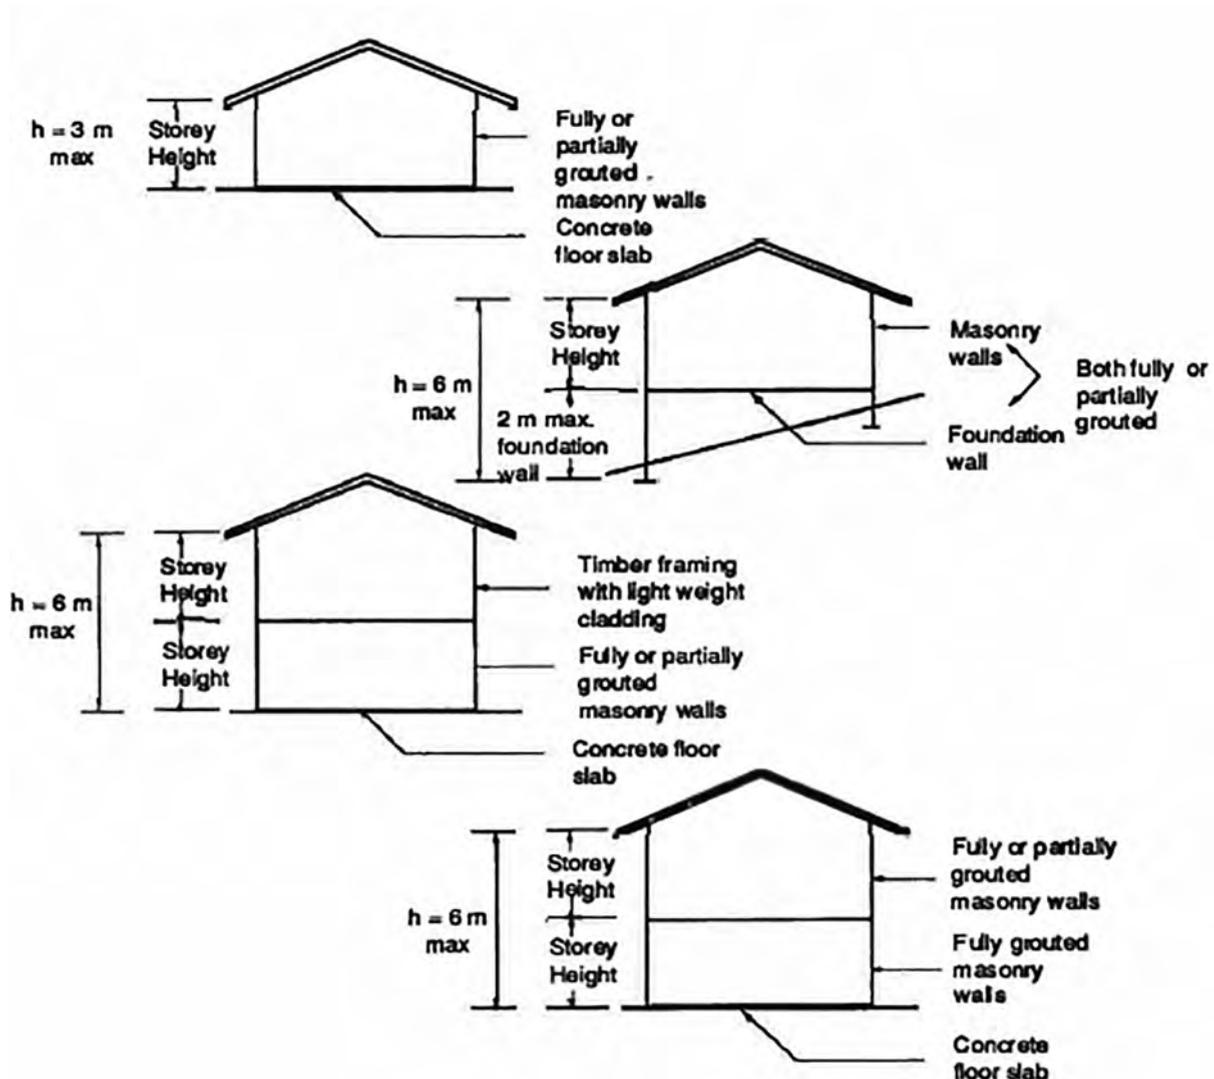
TYPES OF MASONRY HOUSES CONSIDERED
